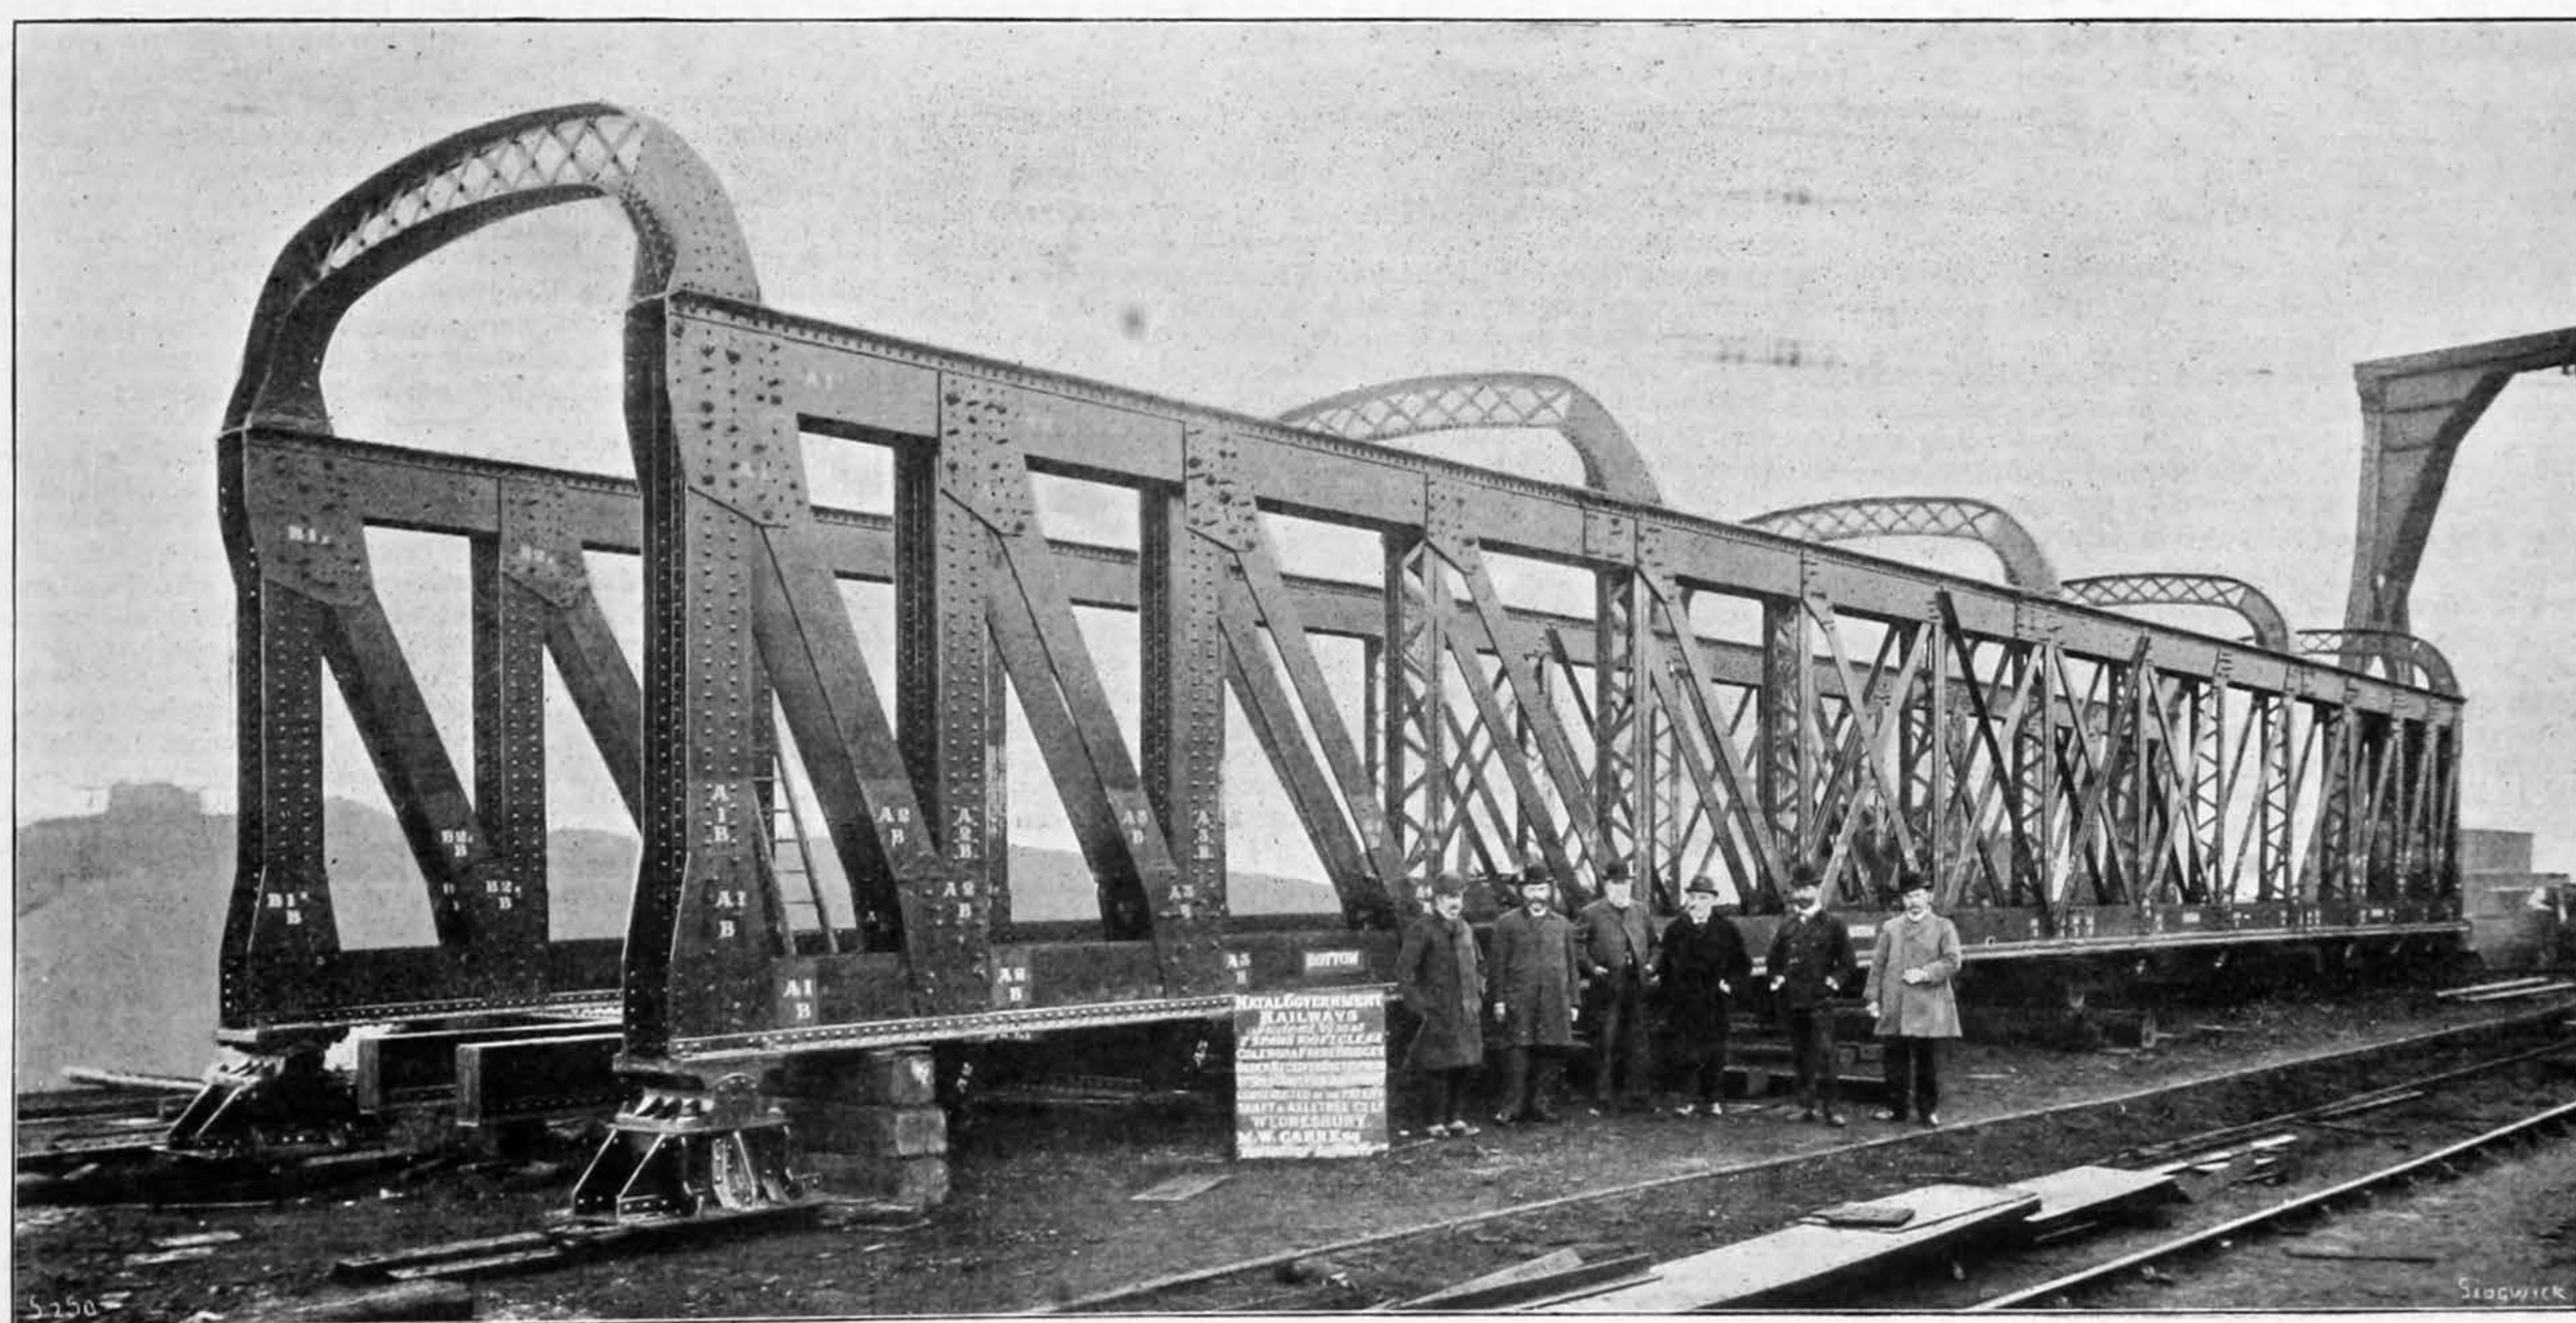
ONE SPAN FOR NEW RAILWAY BRIDGE AT COLENZO.
